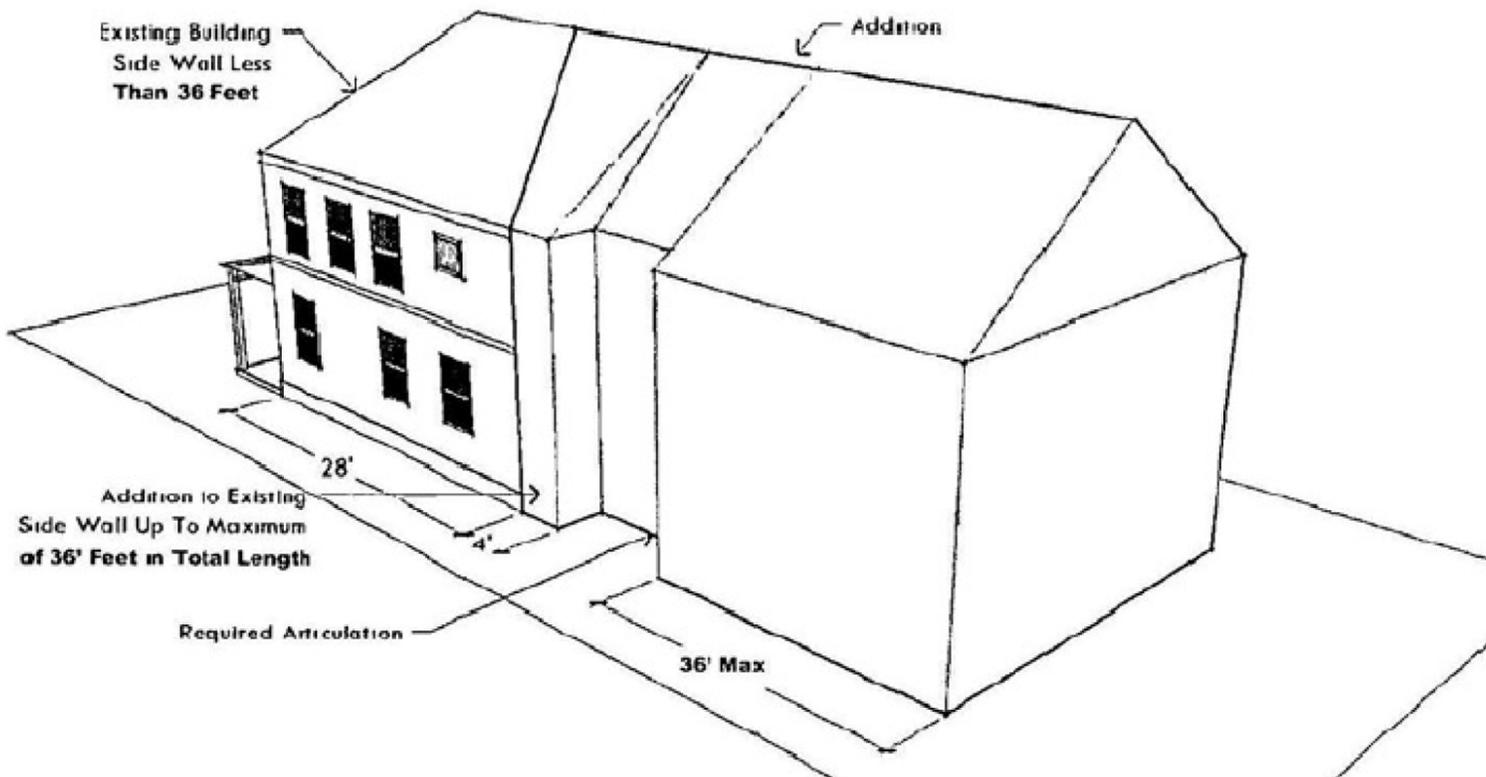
Side Wall Articulation (Existing Side Wall Less Than or Equal to 36 feet)
